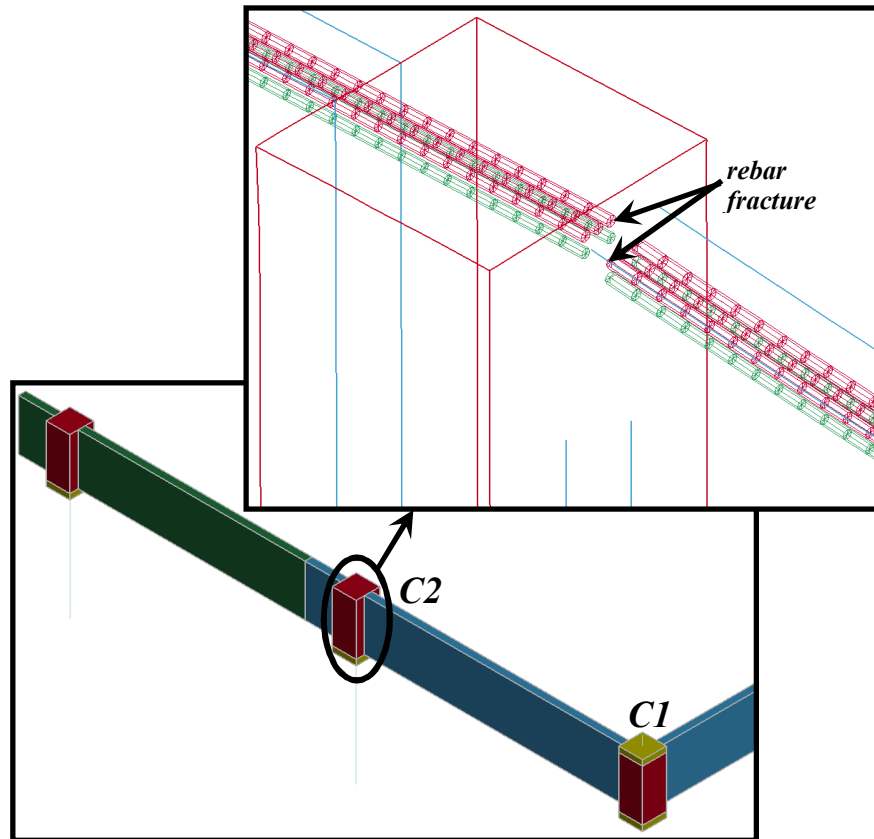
Observed rebar fracture near column C2 during push at corner support in no-slab model at 25 in. vertical deflection. Note that only the beam longitudinal rebar are shown in the inset.
